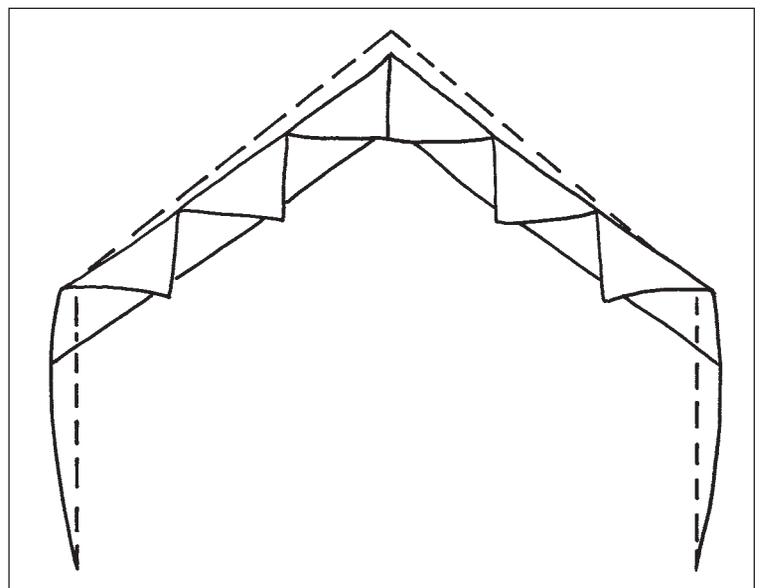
Hammer-beam trusses can be understood as pairs of trussed rafters thrusting outward against their restraints.
